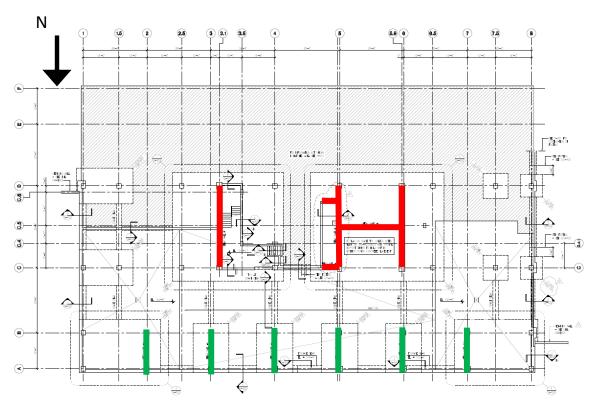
Foundation Plan (Level PO) Showing Shear Walls (Source: Cagley & Assoc. Drawing S-200)
